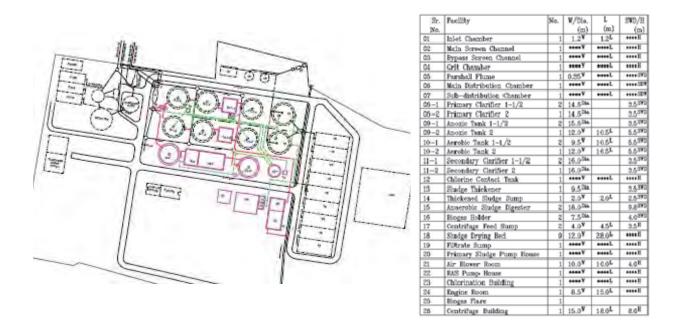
Layout plan of Bhagwanpur STP (Single-stage CND plan, Alternative)
